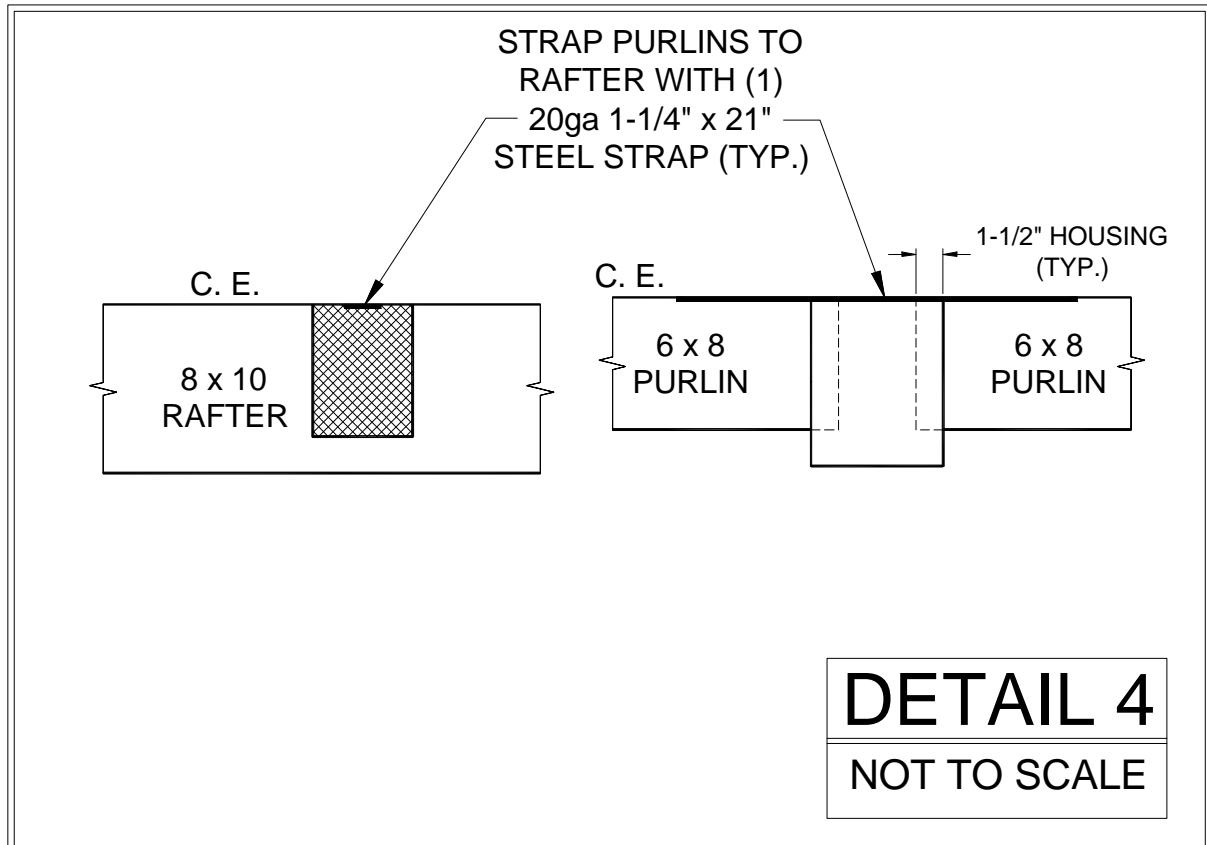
Example of typical center rafter to purlin joint consisting of two housings cut into the rafter into which the purlins fit and are held in place with a steel strap.
